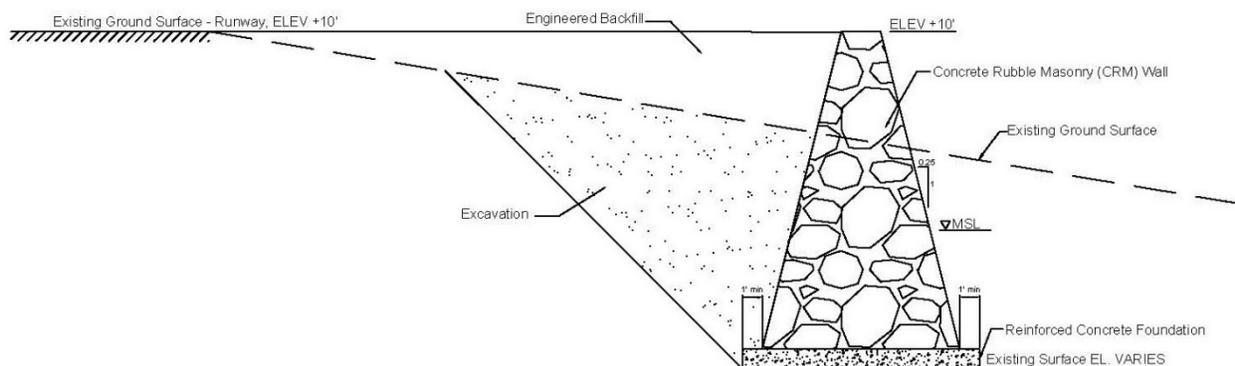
Alternative 3 - Preliminary CRM Wall Cross Section
